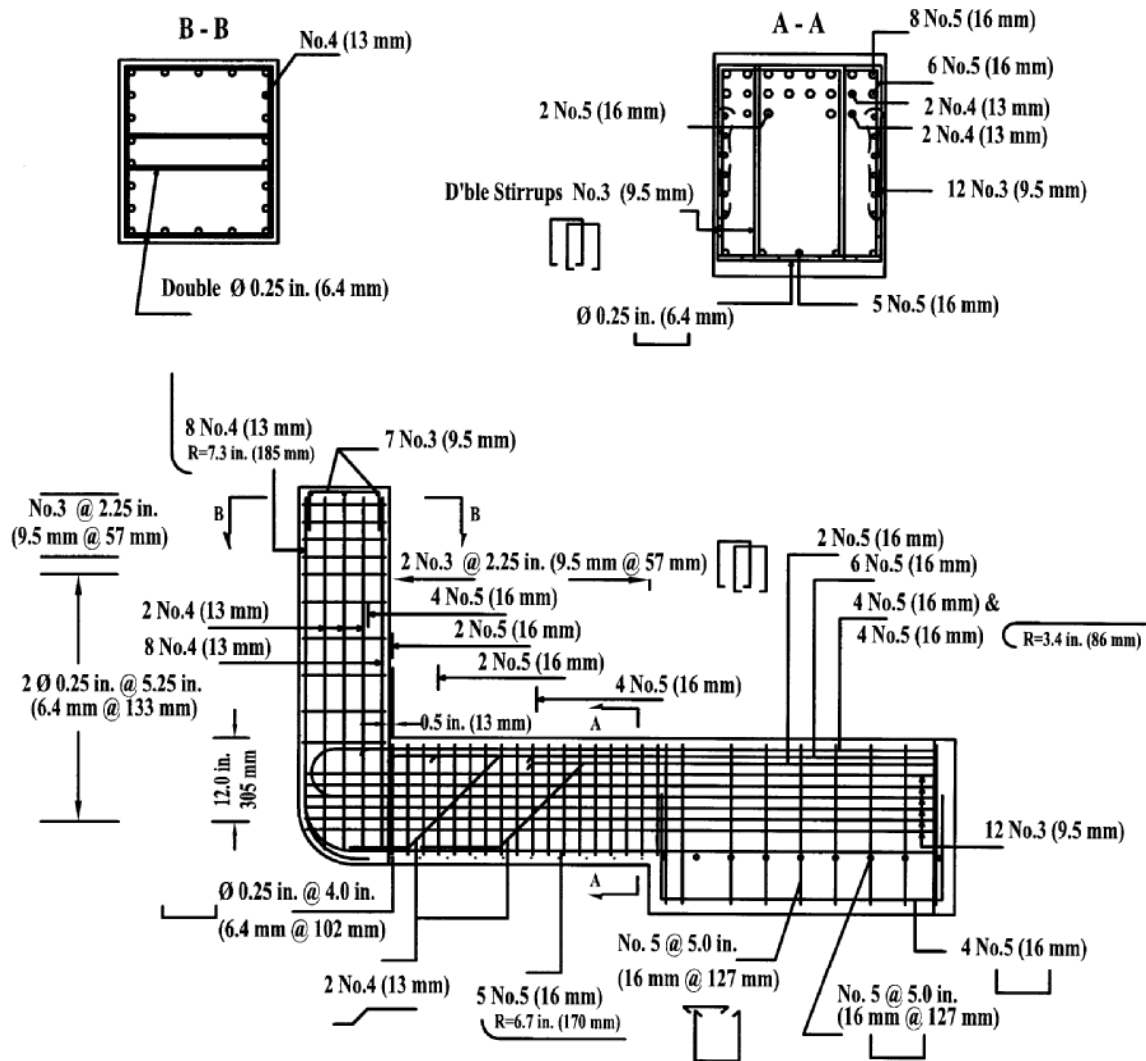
As-Built Long Outrigger Specimen Reinforcement Details
